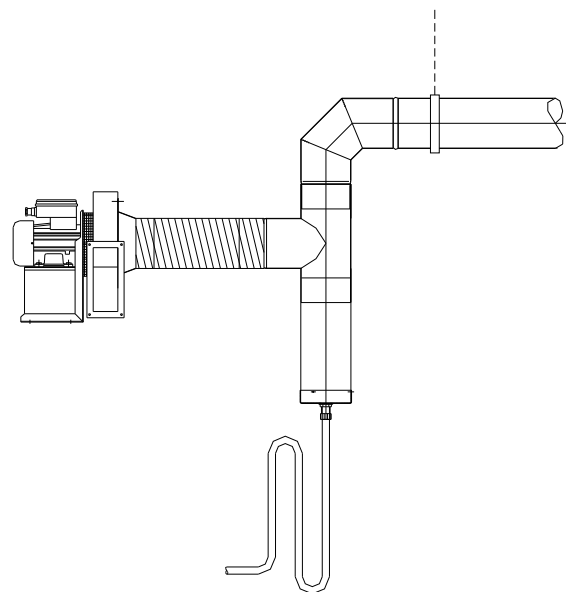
Stainless Steel Telescopic Through The Wall Arrangement (available for Type 'O' and Type '2' fans)
